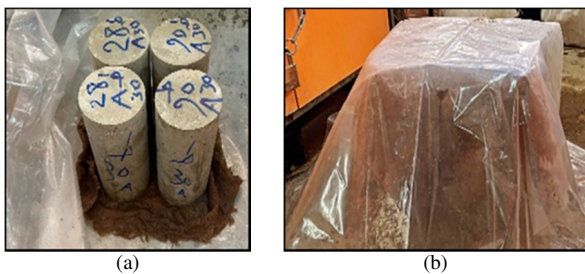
Curing damp-burlap: (a) damp-burlap white and polyethylene sheet with samples, (b) after casing.
